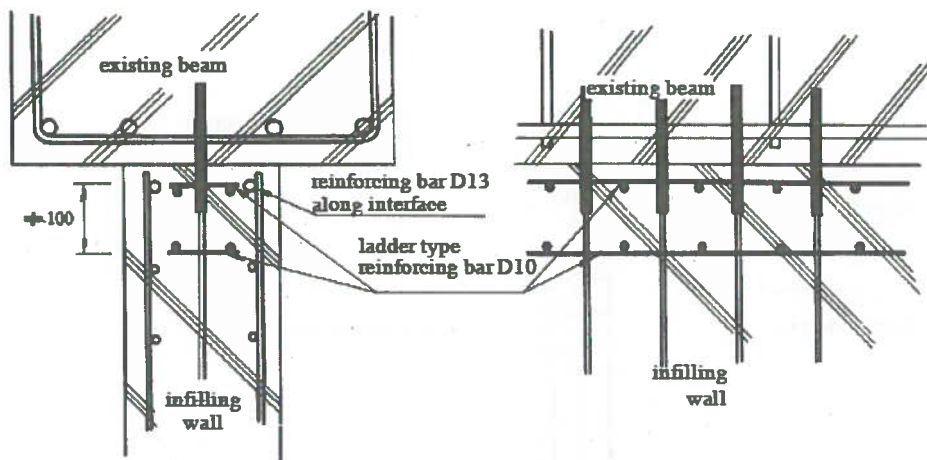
Connection Details of Shear Wall with Existing Beam
